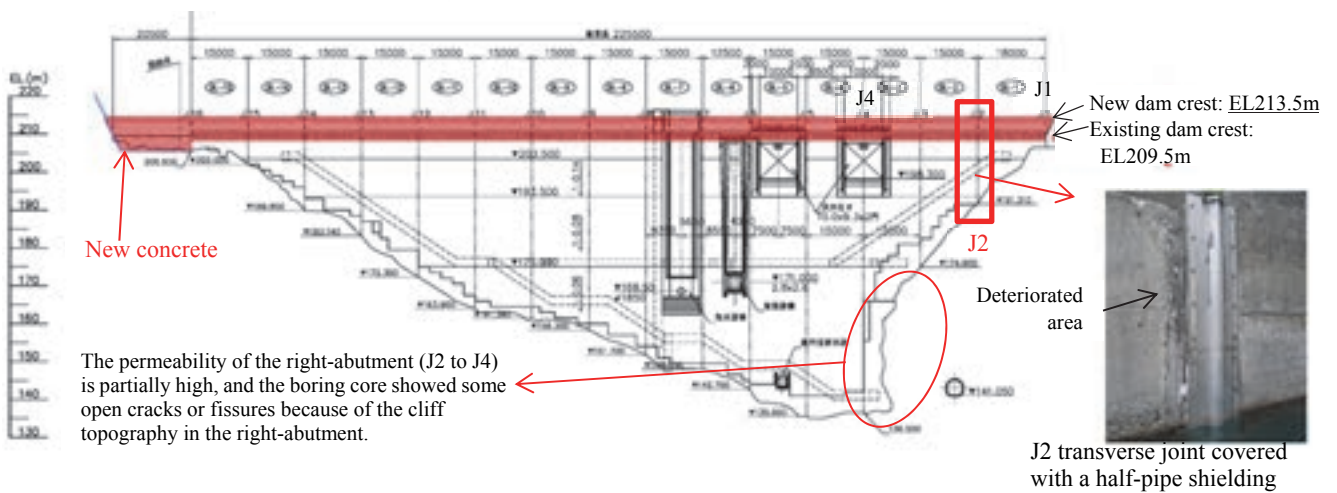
Upstream view of Kasabori dam (meshed zone shows the concrete placing zone)
